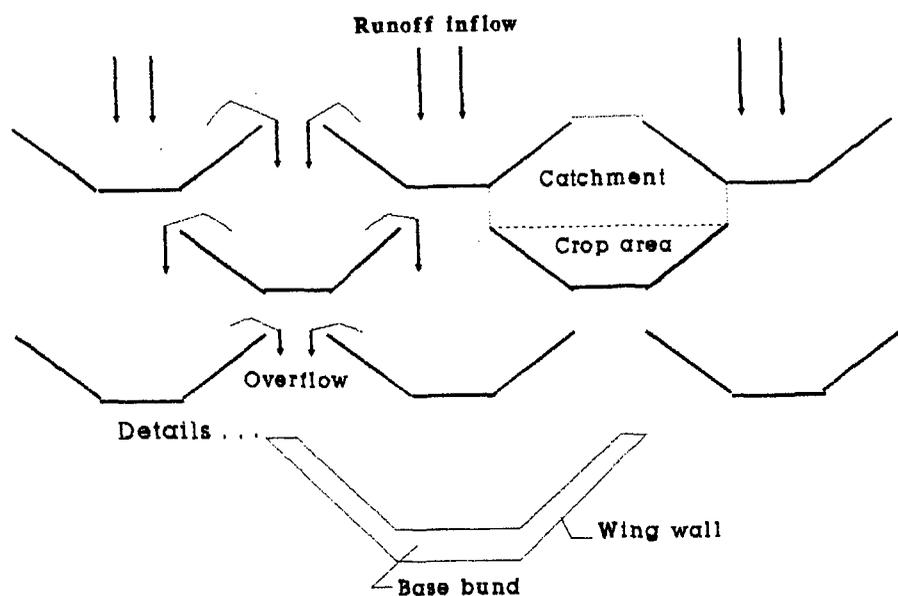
Field layout of trapezoidal bunds and details of a single bund.
